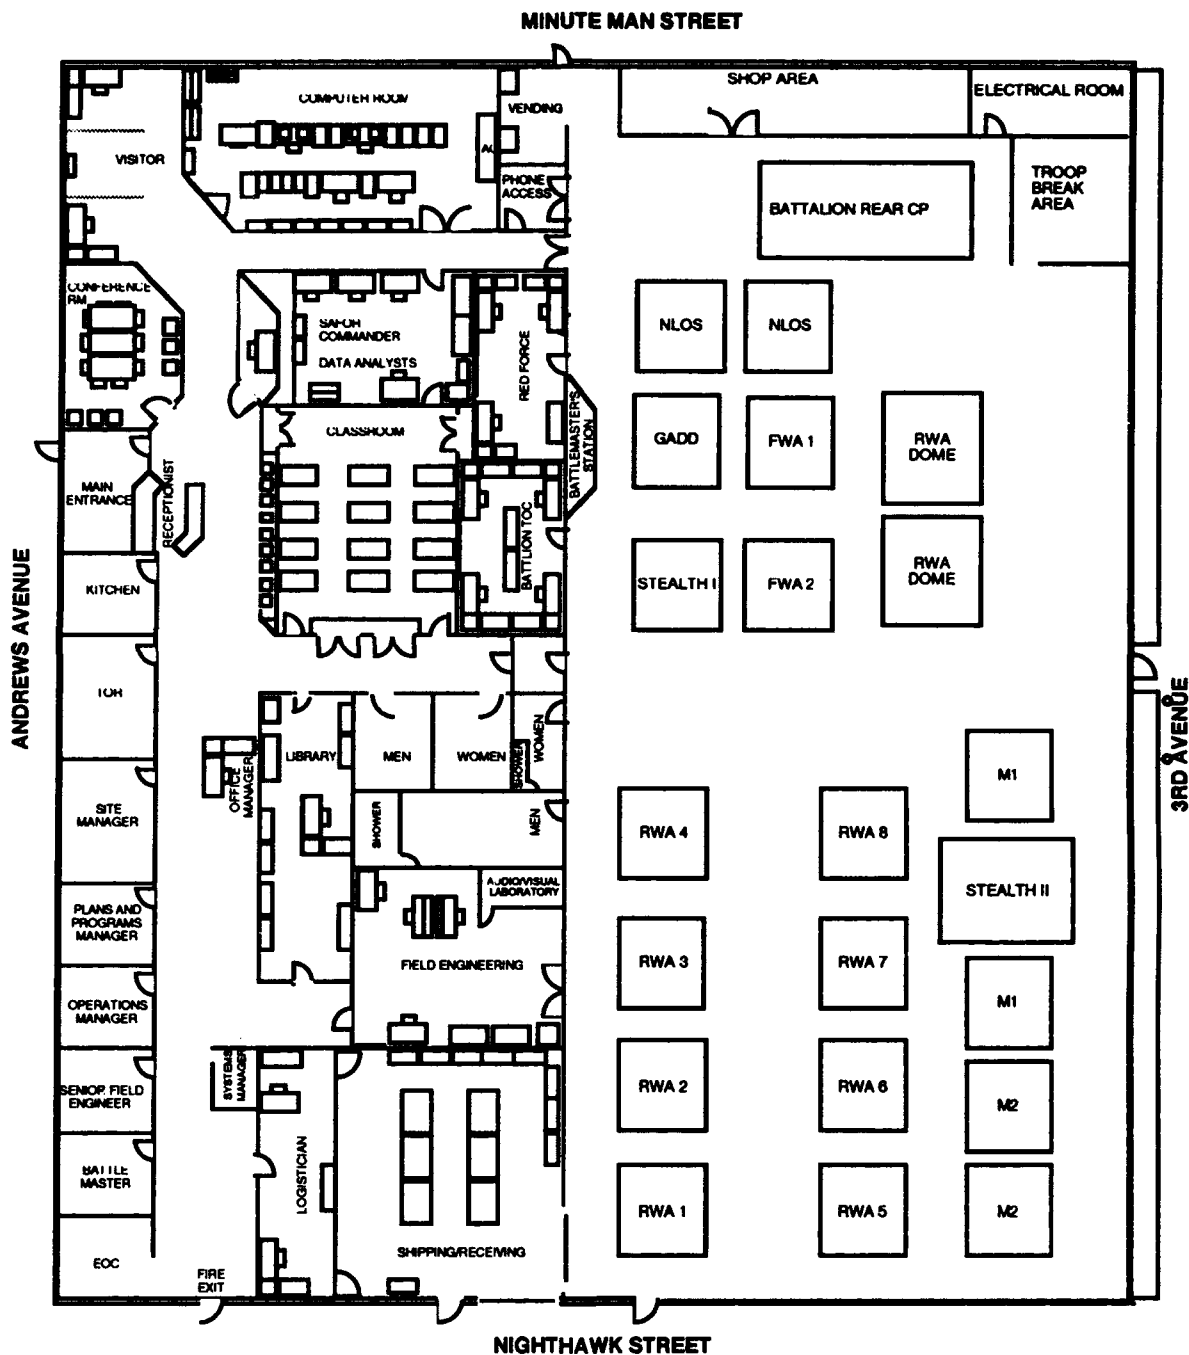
Fort Rucker Aviation Test Bed Facility Layout
